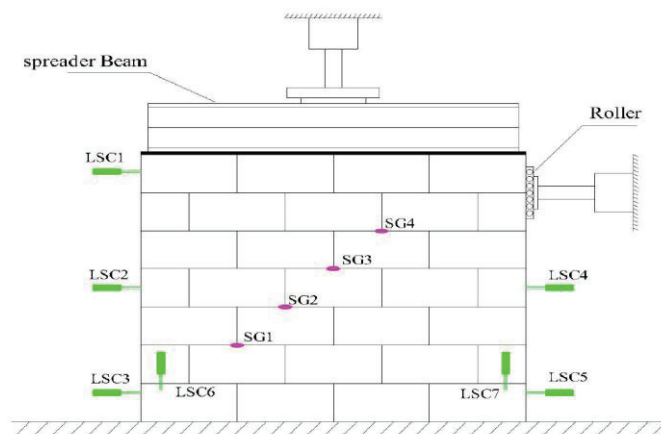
Test setup for PG masonry walls (Oan and Shrive, 2012)
